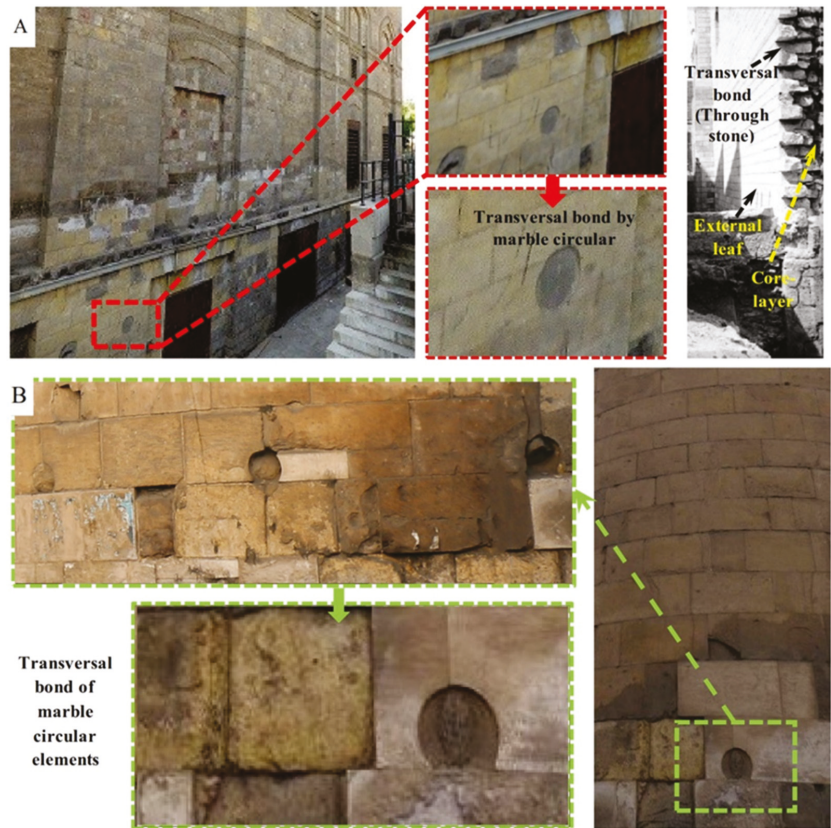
Transversal bond elements to enhance the connectivity between wall leaves: (A) external wall of Bab Zuwayla and (B) main façade of Masjid al-Salih Tala'i.
